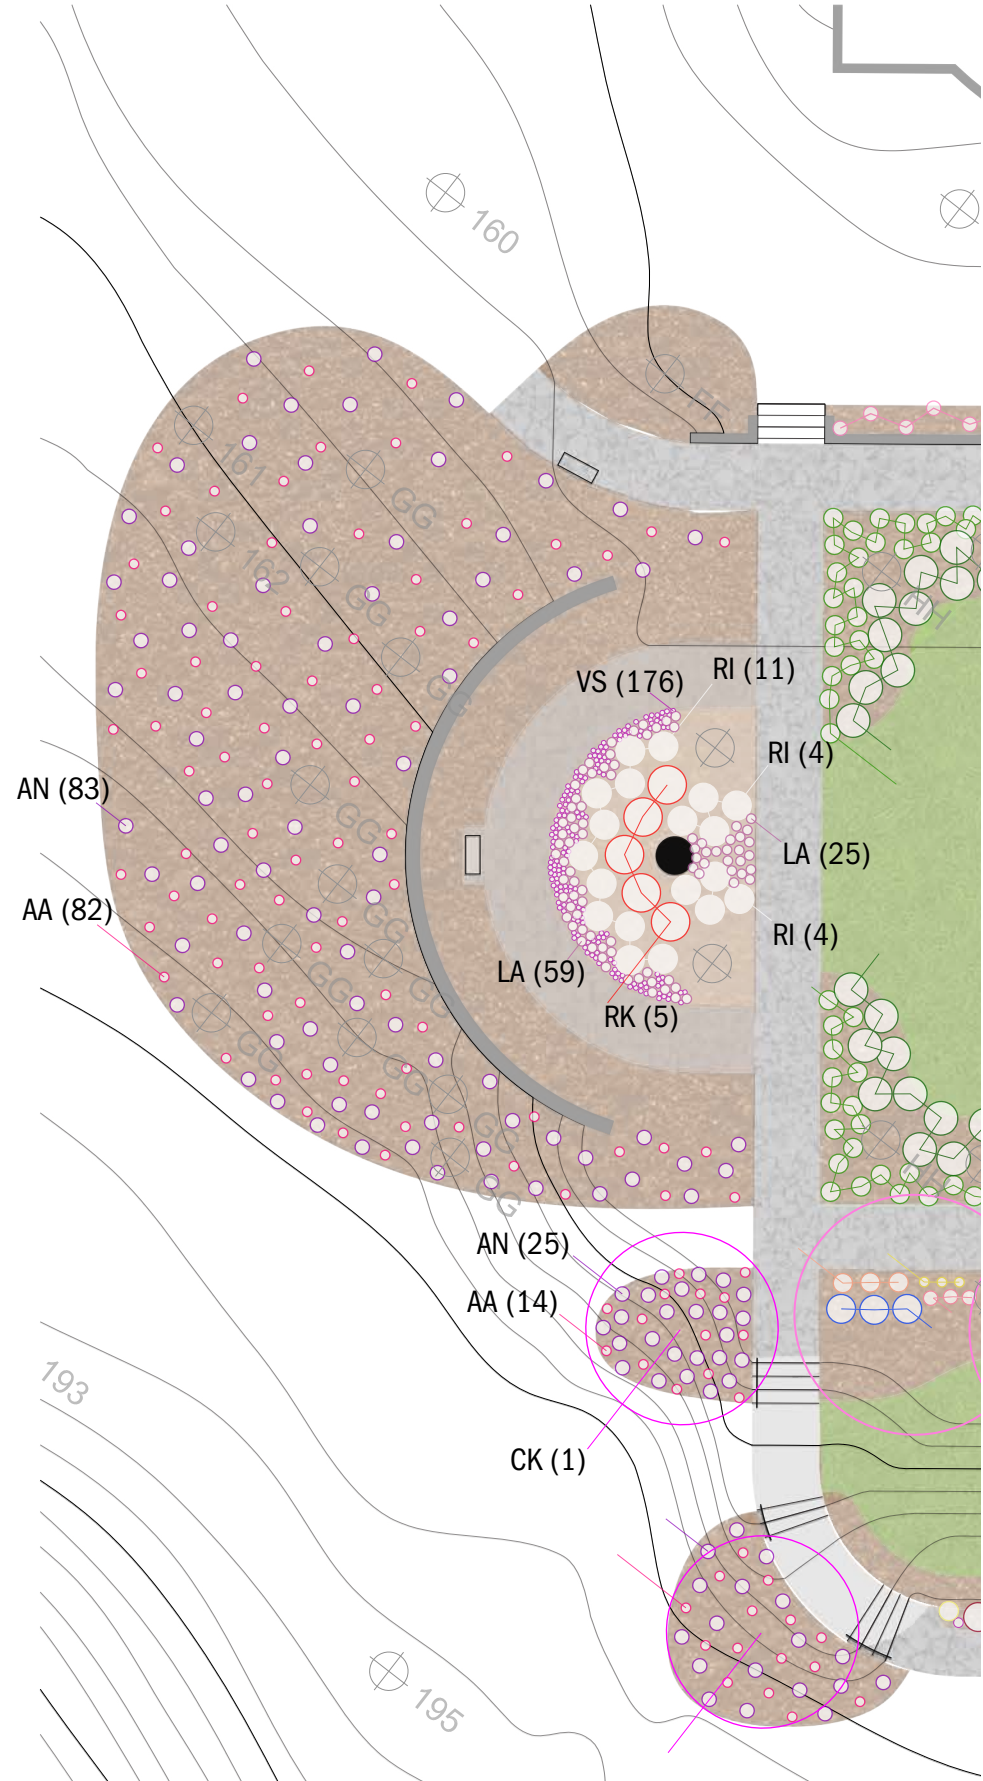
Illustrated planting plan for the proposed Diversity Planting beds and stairwell plantings in the Italianate Garden.
